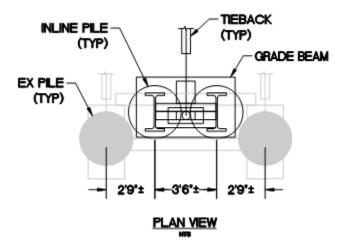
Tieback Anchor at Inline Piles - Trackbed Support Retrofit Areas
